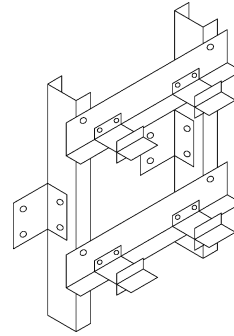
Subframe and fixing kit type 2 (with horizontal profile)
